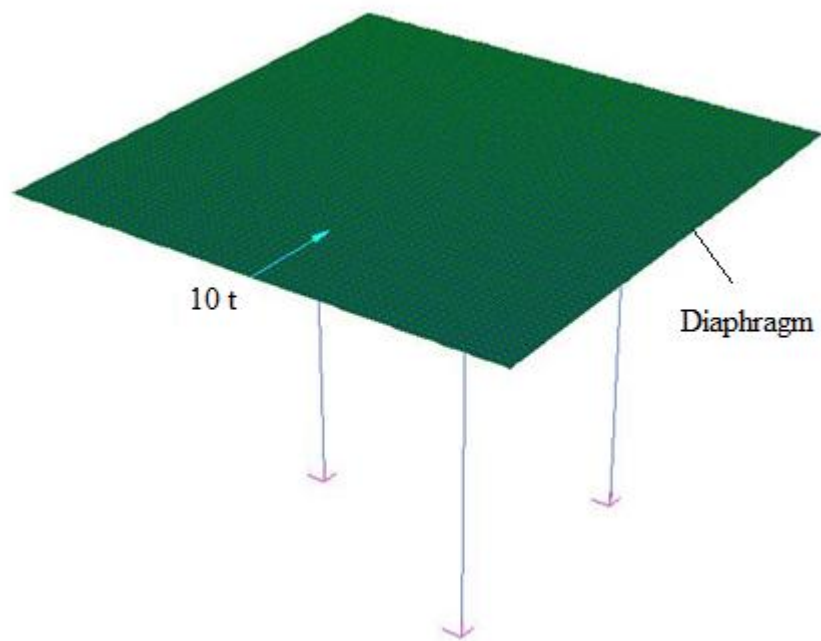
Frame element column model with slab plate bending finite element model (model 3).
